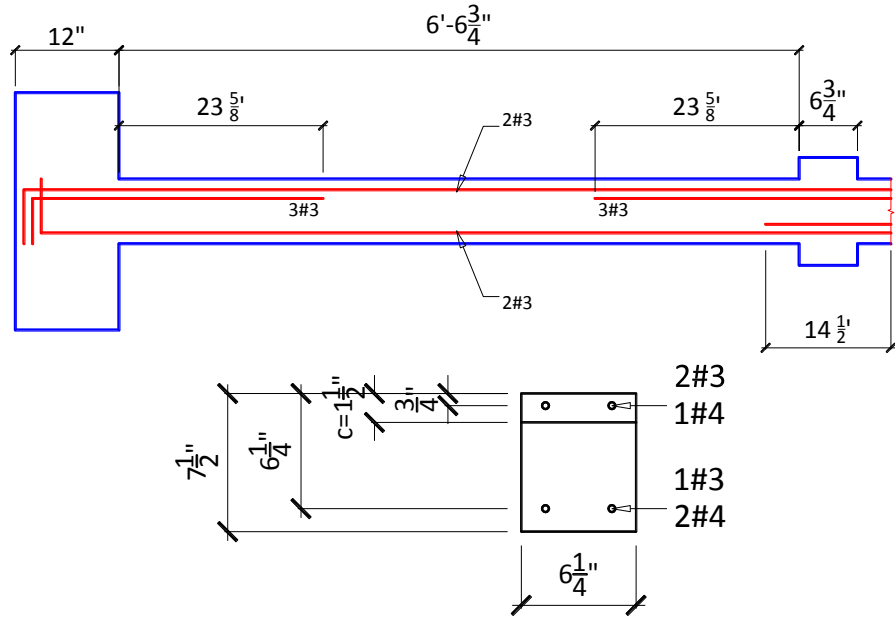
Reinforcement detailing of Sasani and Kropelnicki's experimental beam (Sasani and Kropelnicki, 2007).
